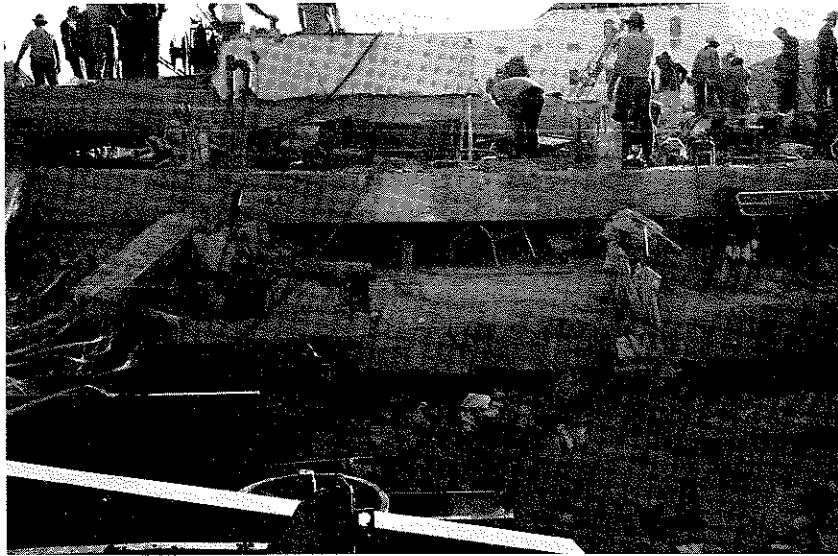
Details of collapsed structure, Veterans Hospital. Building in background was not damaged significantly.
